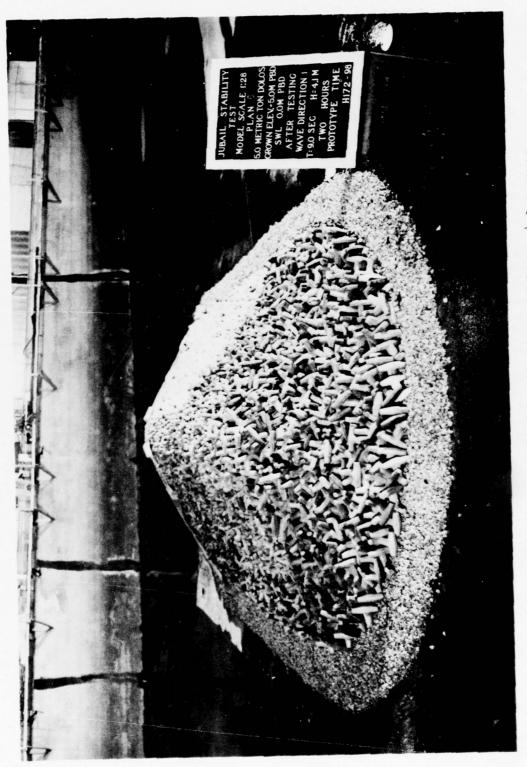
End view of Plan 6 after attack of 9-sec,  $\mu$ .1-m waves from wave direction 1
